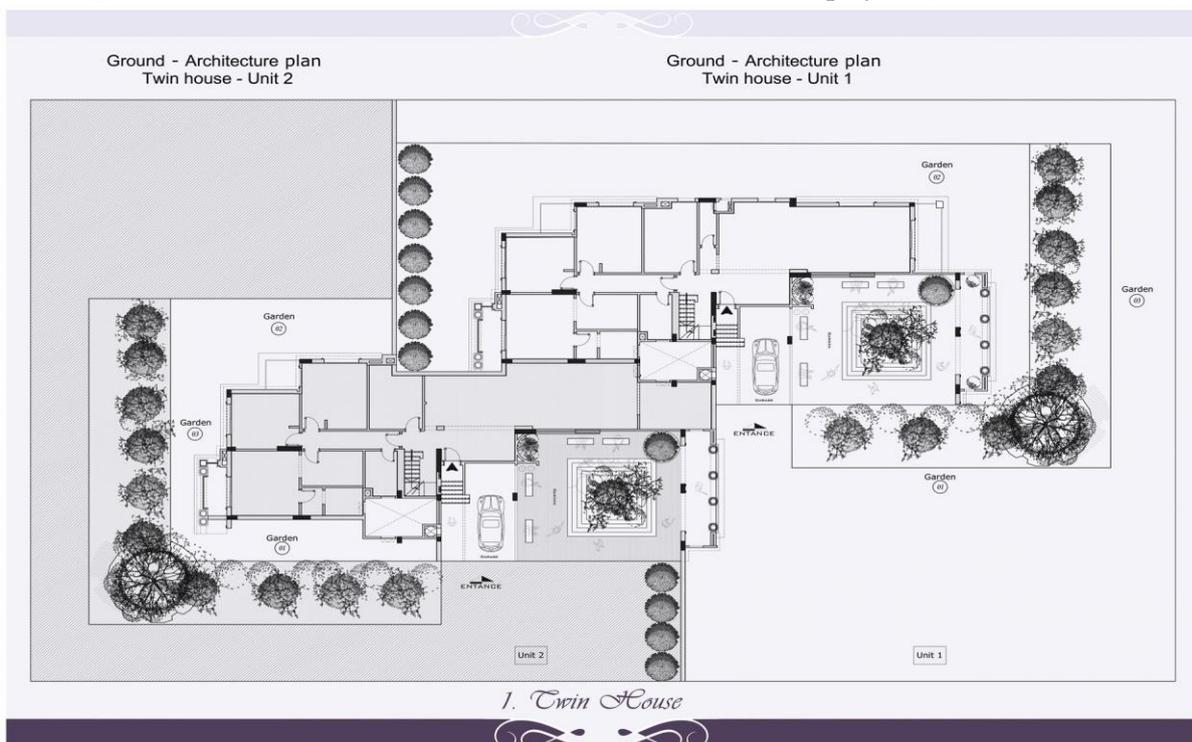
Site map Floor Plan of Twin House project which consists of two units of Twin Houses (Unit 1 and Unit 2). (source: Auther,2021).
